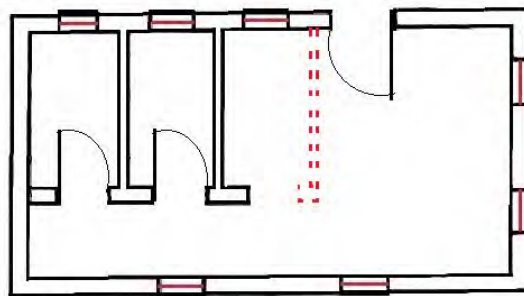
2018 floor plan of gentlemen's toilets with changes shown in red. Source: pdarchitect
